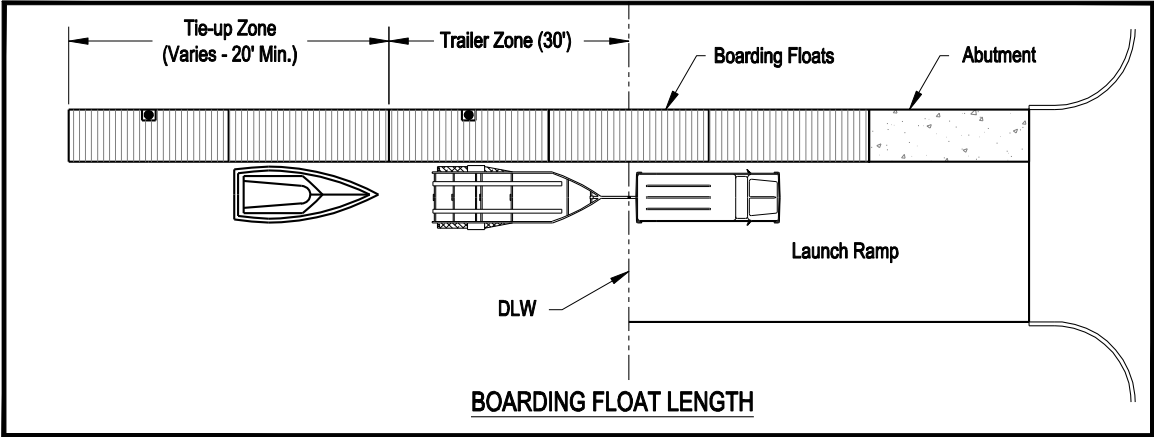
Boarding floats showing minimum 50-foot length at design low water
